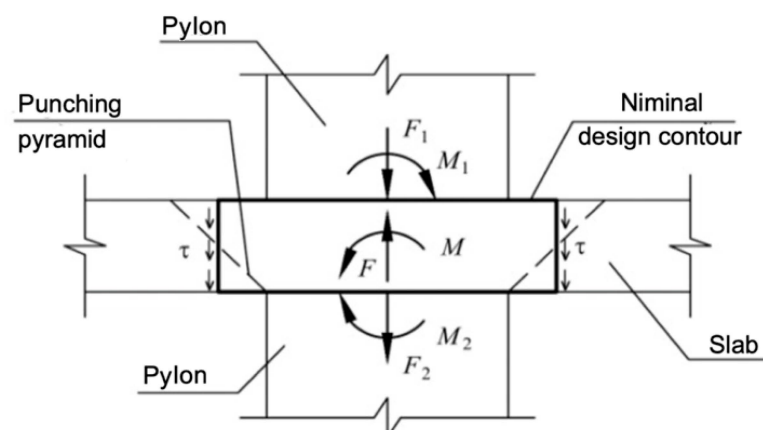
Calculation diagram of a reinforced concrete floor slab unit.
